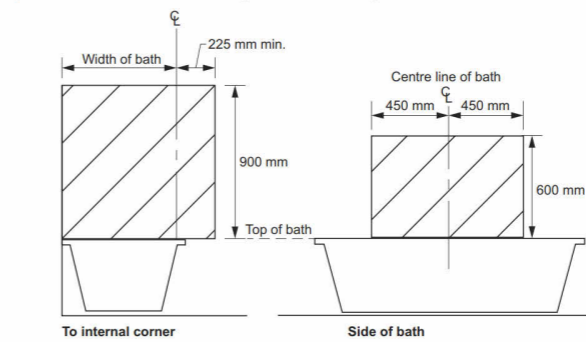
Taps, bath niches, soap holders and the like may be located within the positions designated for wall reinforcing. (2) Where the height of the bath tub is not yet known, an assumed height of 500 mm above finished floor level may be used to determine the location of wall reinforcing.
